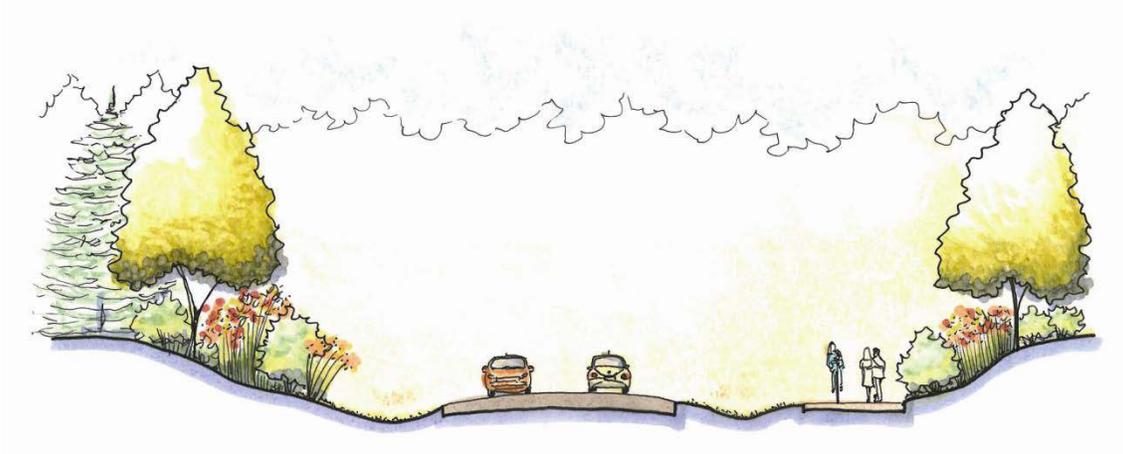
B: Typical cross-section of an existing arterial street without parking
